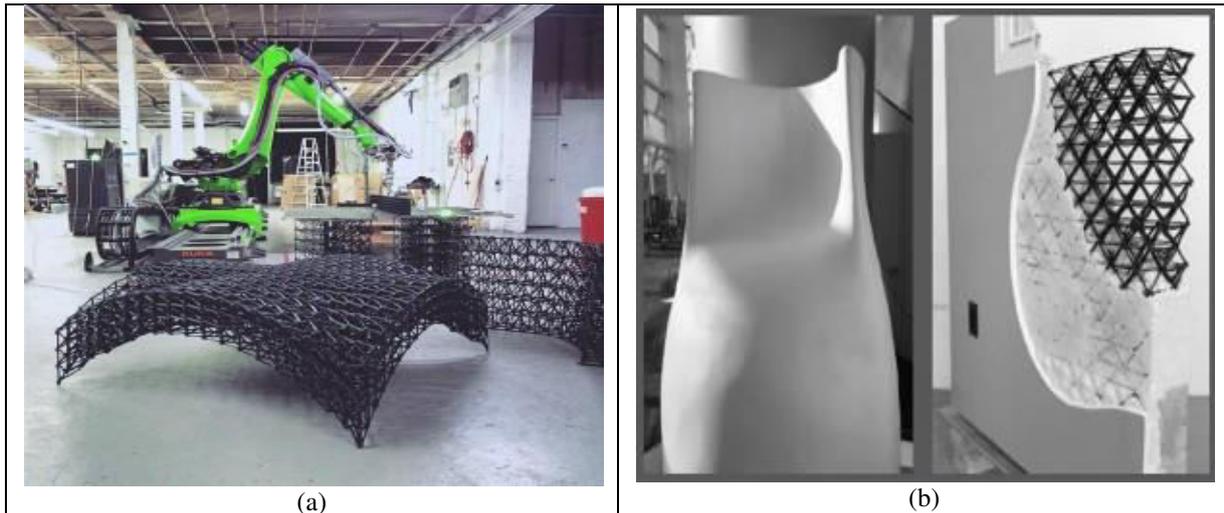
Method of 3Dprinting C-Fab: (a) non-metallic reinforcement cage; (b) wall fragment.
